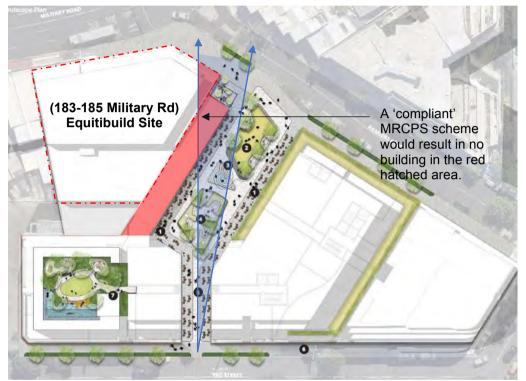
Applicant landscape plan for proposed plaza (source: Applicant's Urban Design Report, p. 38)
